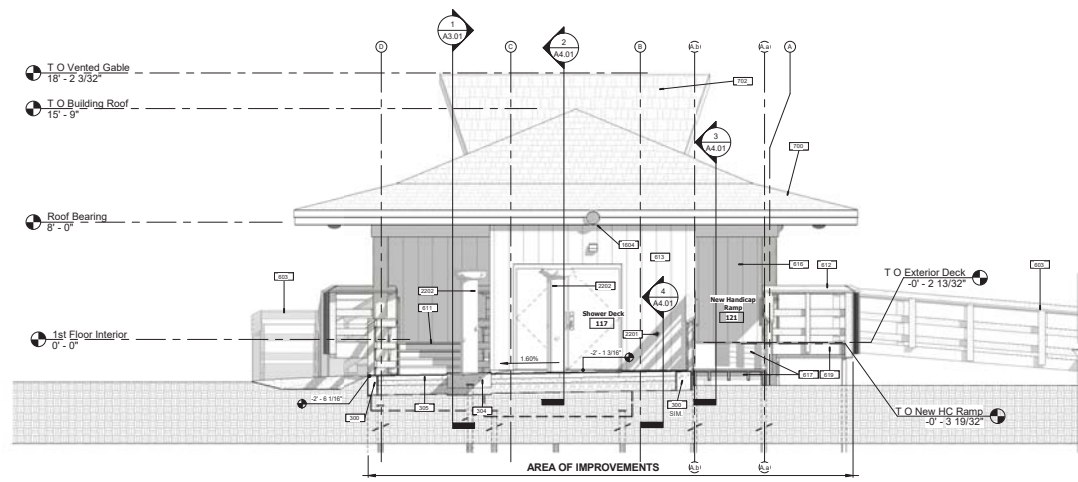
EXHIBIT A - Lowdermilk Facility Improvement Drawings S & S
